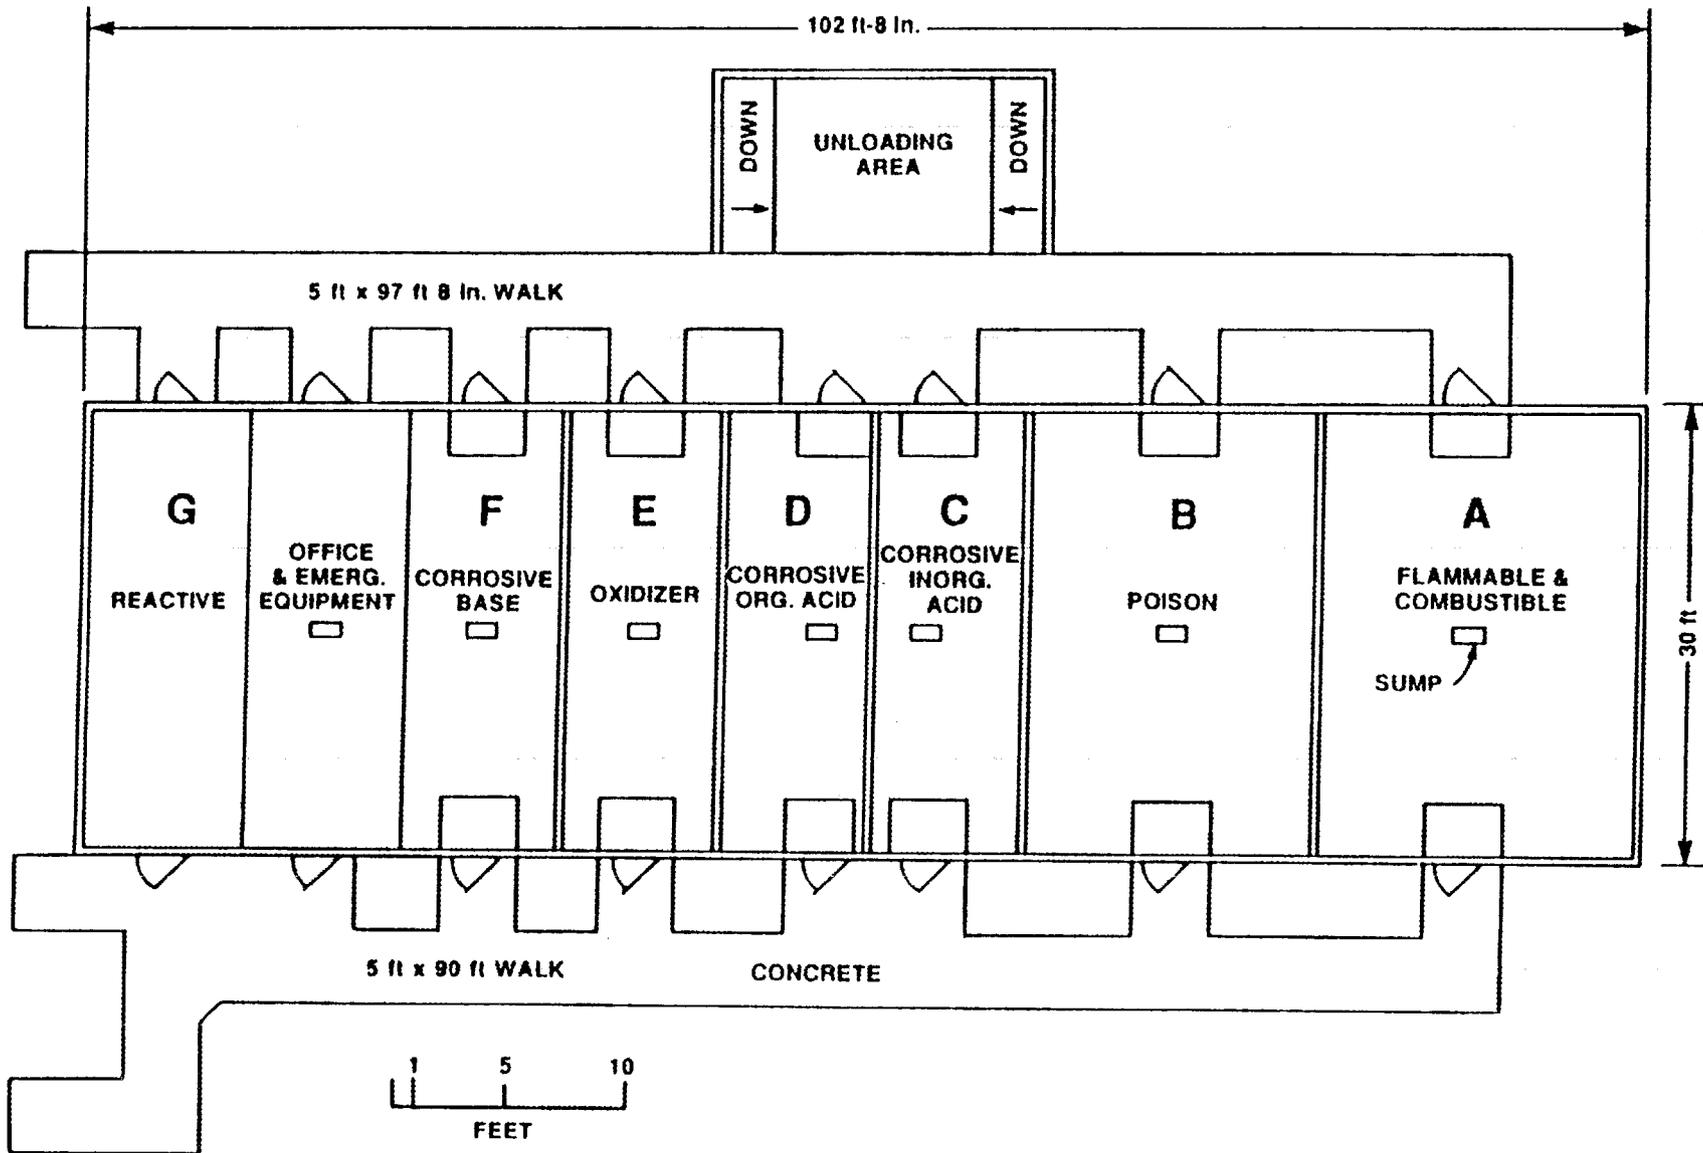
Layout of Building 7653, Chemical Waste Storage Facility.
